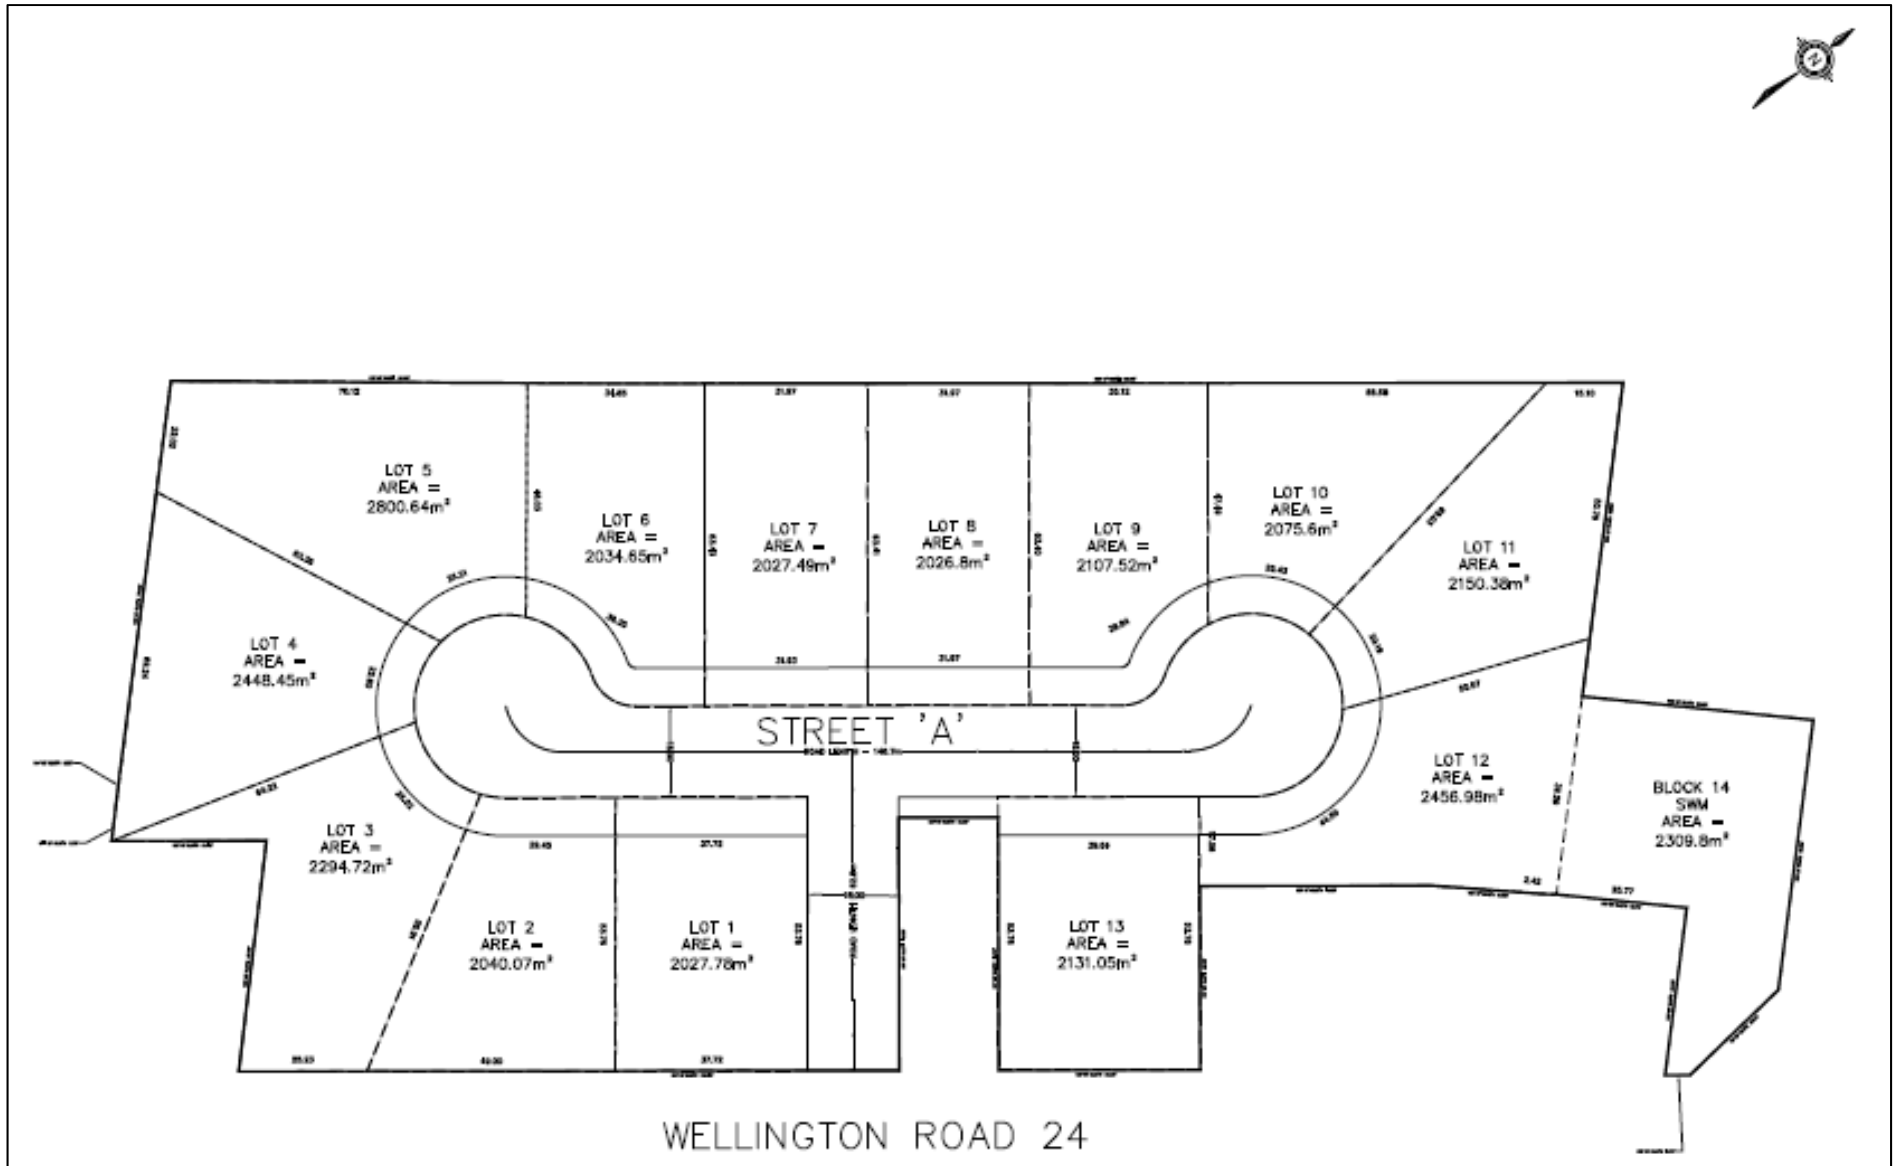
Site Plan – Scenario 2 Configuration
